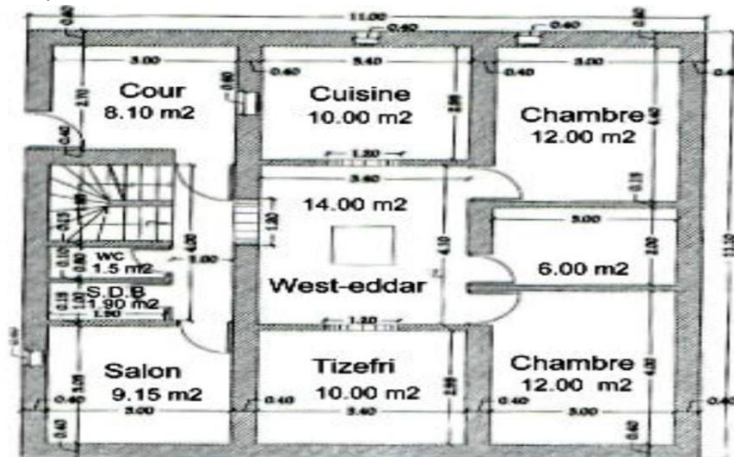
A floor plan of a house in the K'sar Tinemmirine
